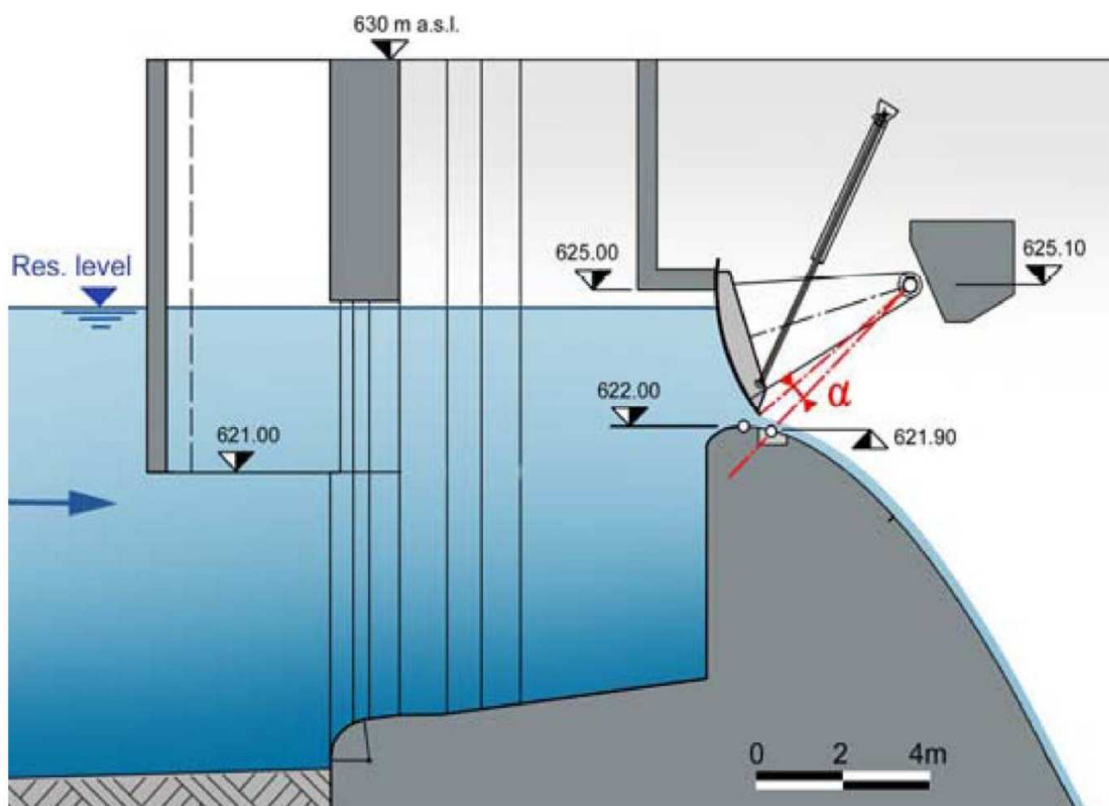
Definition sketch for Ufsarlon Intake with partly closed gate, ice skimming wall and trashracks [5]
